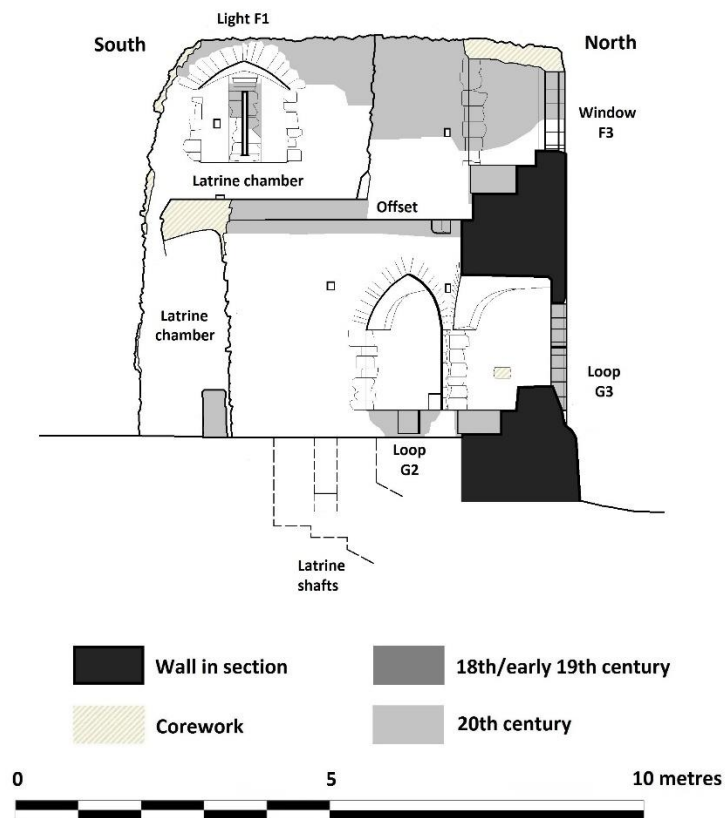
Leybourne Castle gatehouse – west-facing elevation
